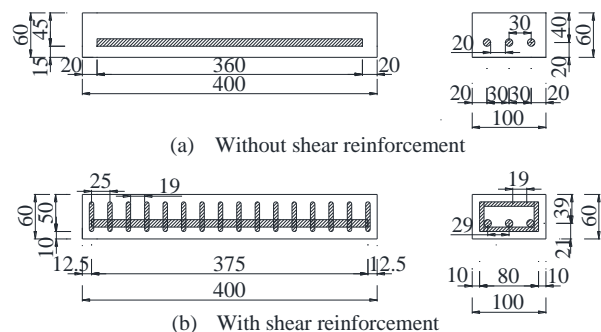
Dimension and configuration of RC beams (Unit: mm)
